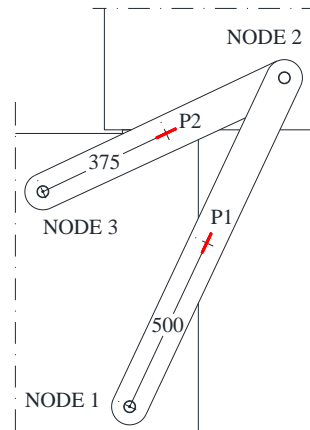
Geometrical layout of the strain gauges on the steel profiles in the test 2 (dimensions are expressed in mm)
